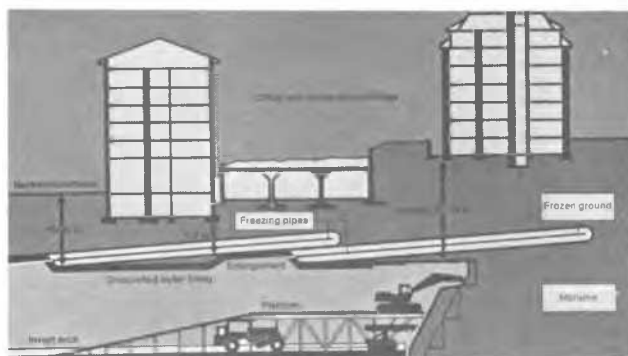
Longitudinal Section for Freezing Sections 3 and 4 (see fig. 4)
